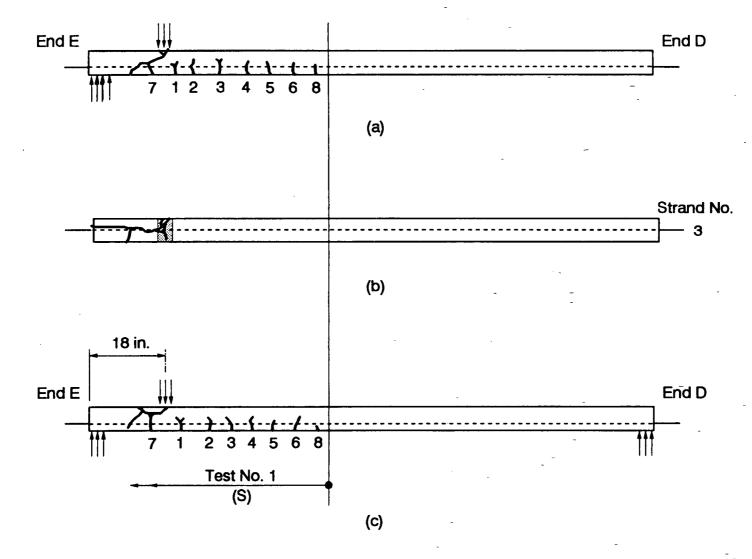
Crack pattern for D-type Specimen No. 17-6.0DC-11:
